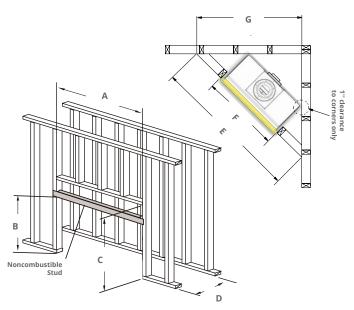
b Framing dimensions (Straight wall & Corner Installation).
